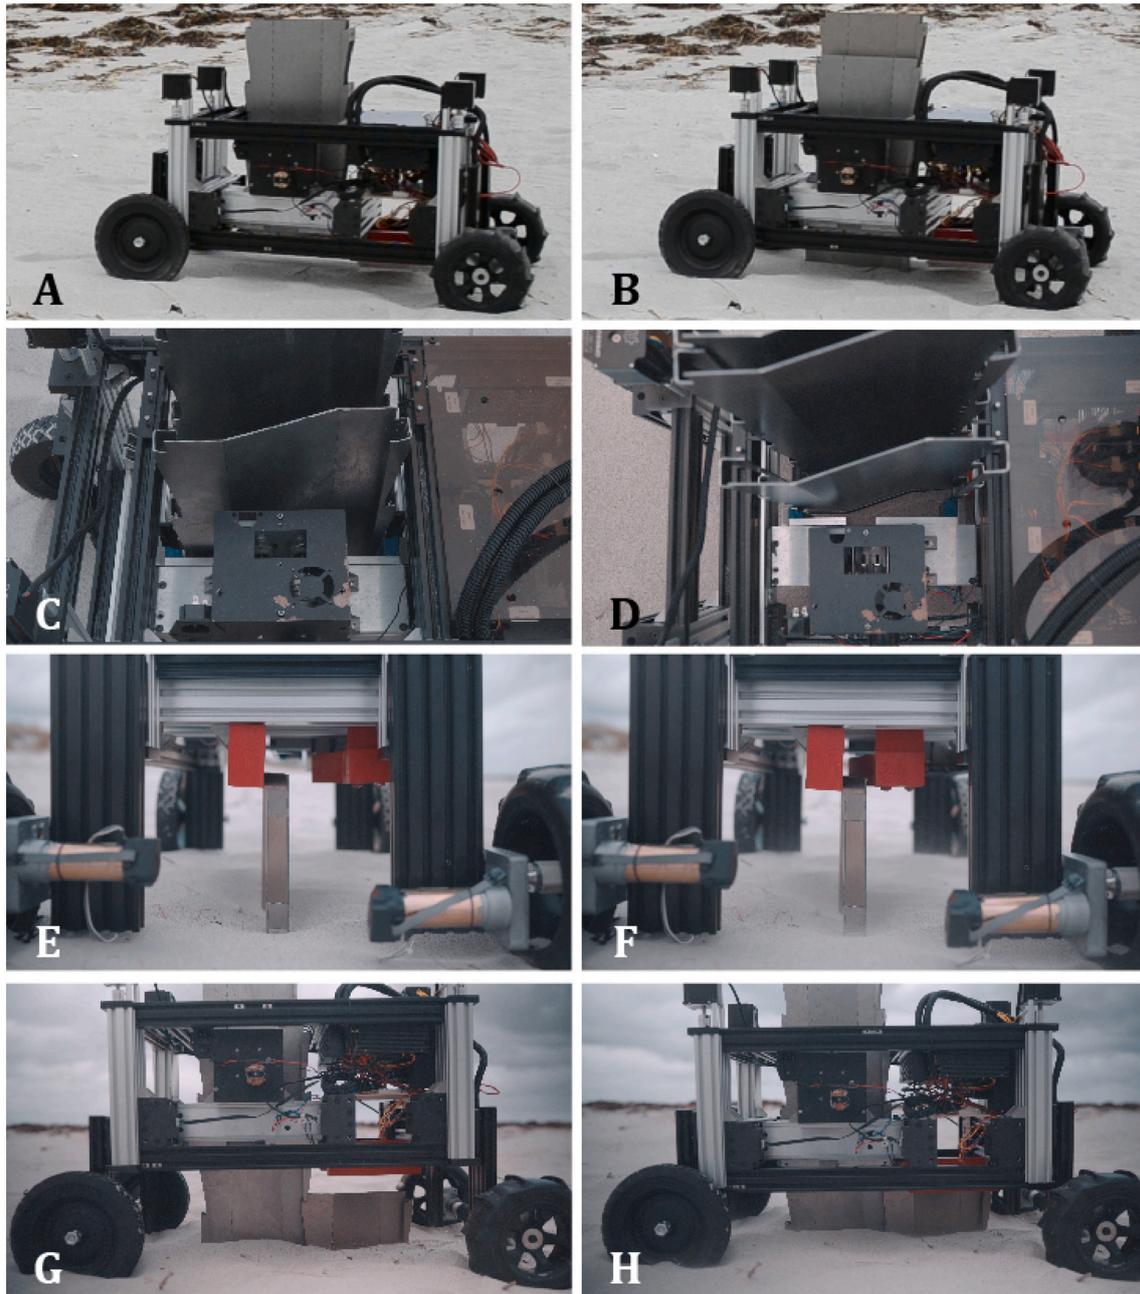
Process of initiating a sheet pile wall or extending an existing one (details in text).
